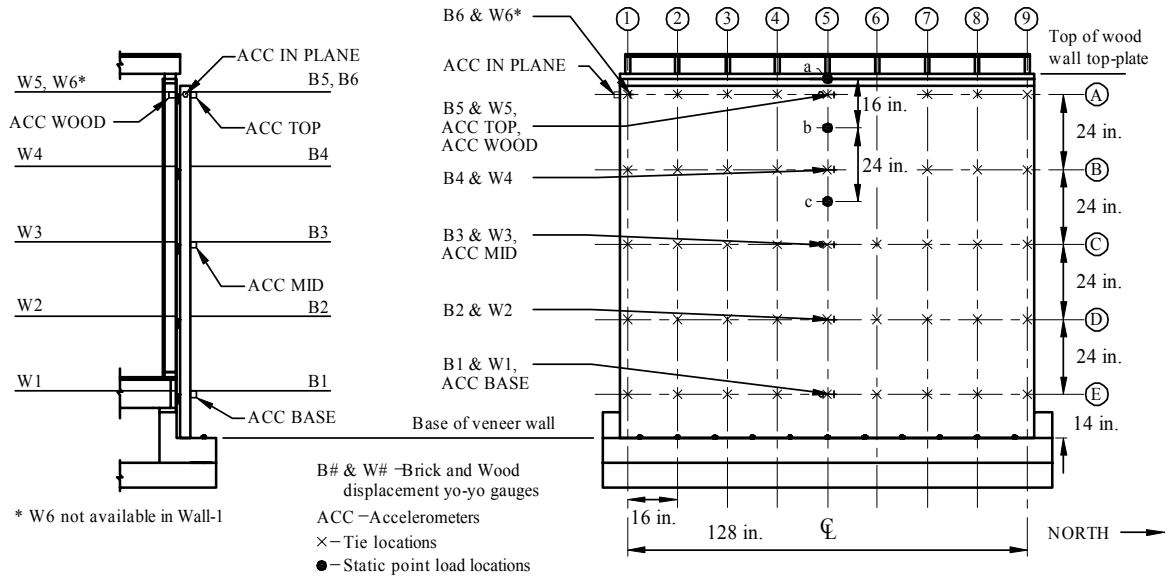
Wall-1, -2, and -2b specimen instrumentation, static point load location, and tie grid layout.
